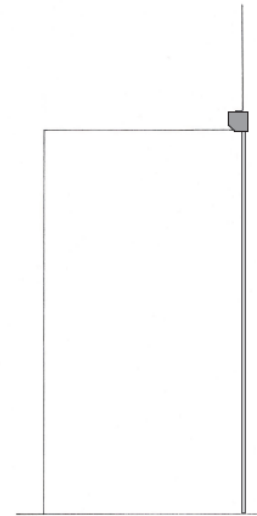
Cross Section of Proposed Shop Front (shutter open) #2 [1:50]
